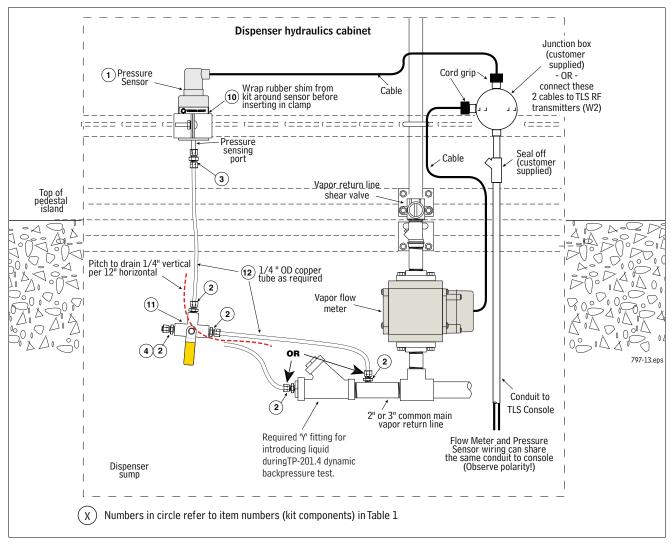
Example Pressure Sensor Install In Horizontal Access Fitting Or Vapor Return Line - ISD Installation (With Vapor Flow Meter Below Shear Valve)
